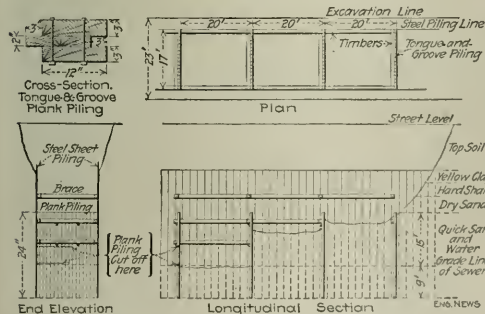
SHORING AND BULKHEADS IN ST. LOUIS SEWER TRENCHES
